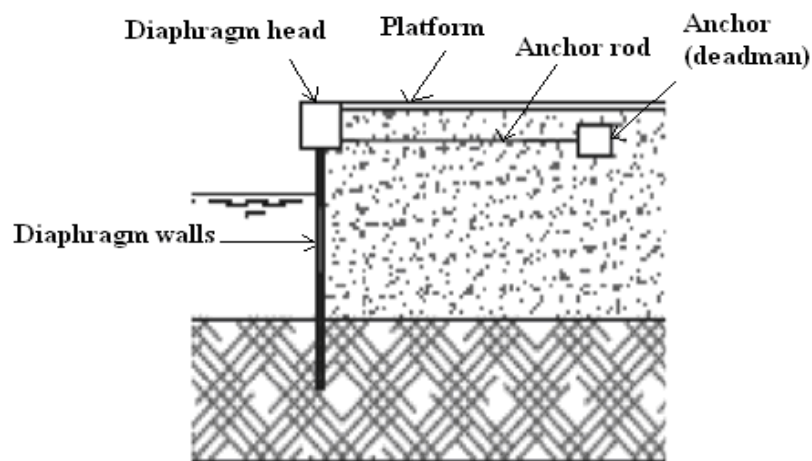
vertical face type structure (Gaythwaite, 1981)
